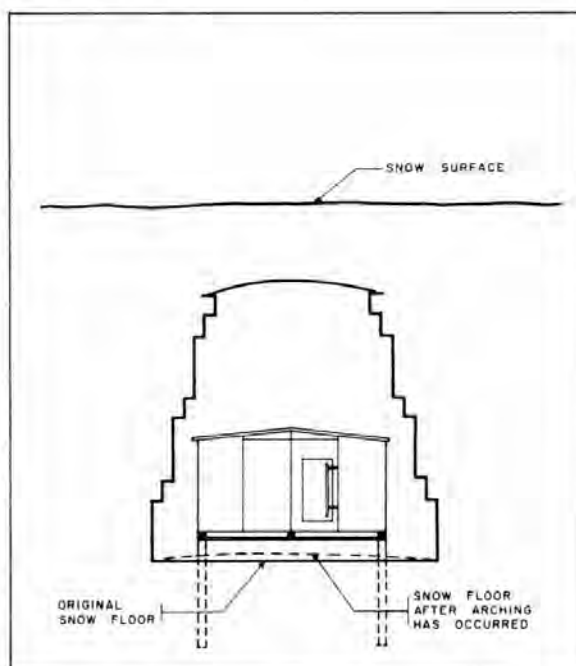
Piles spaced symmetrically with respect to floor centerline.
